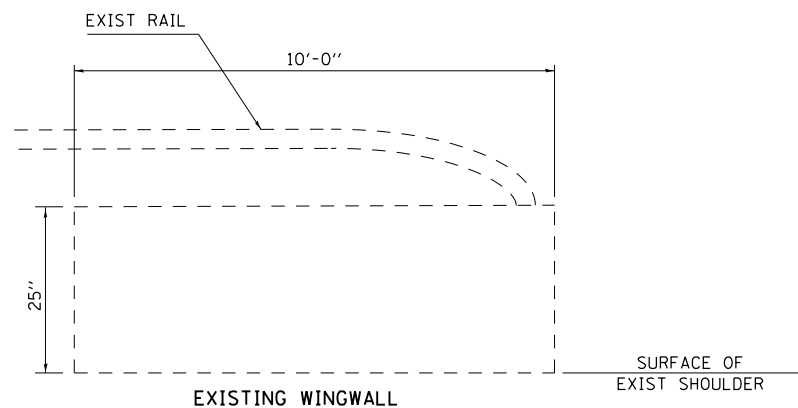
DETAIL OF PROPOSED SHOULDER TREATMENT UNDER OVERPASSES
